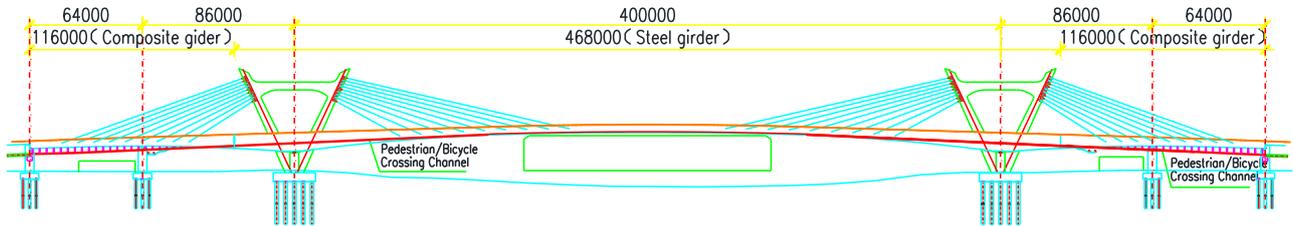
General layout of the Zhongxing Bridge (unit: mm)
